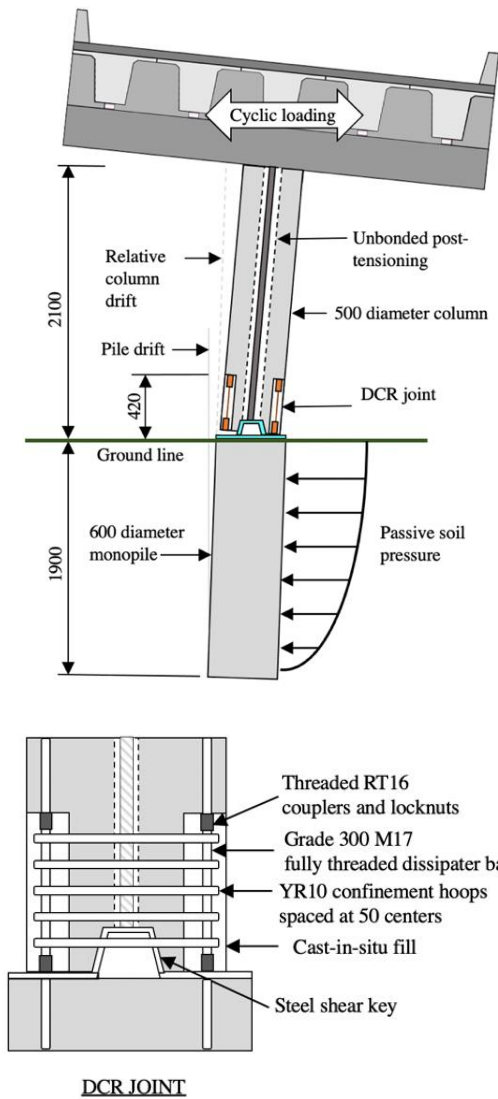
Cantilevered bridge pier with a DCR connection at the column-pile connection. Units are in millimetres.
